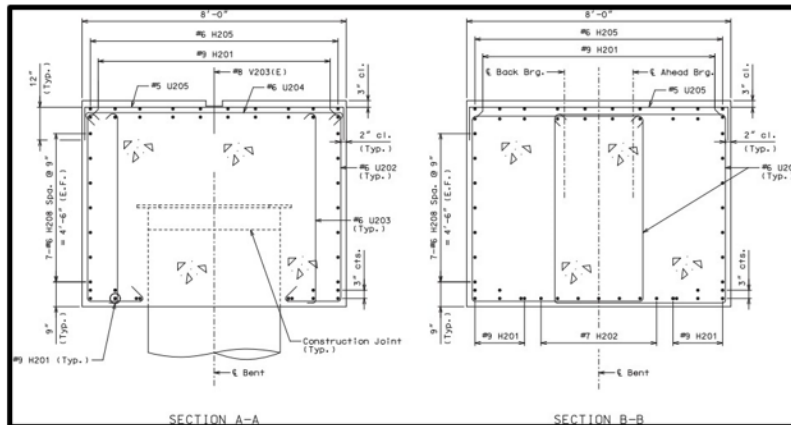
MoDOT: Shear studs detail for pile to bent cap connection, Champ Clark bridge
